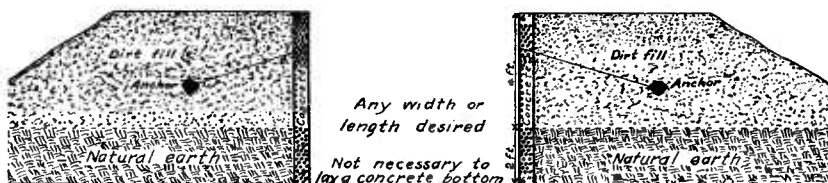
The horizontal concrete silo; illustrating a plan for a silo with concrete retaining walls built perpendicular and smooth. This facilitates solid packing at the edges and makes it possible to exclude the air. The wall is anchored at intervals to prevent its being pushed in when the heavily loaded wagon is driven over the dirt fill. Much less dirt goes into the silo when the tops are forked from the wagon into the silo. The width should be sufficient to allow driving the team and wagon through to pack the tops and also to load in taking out the silage. Good drainage is essential.
